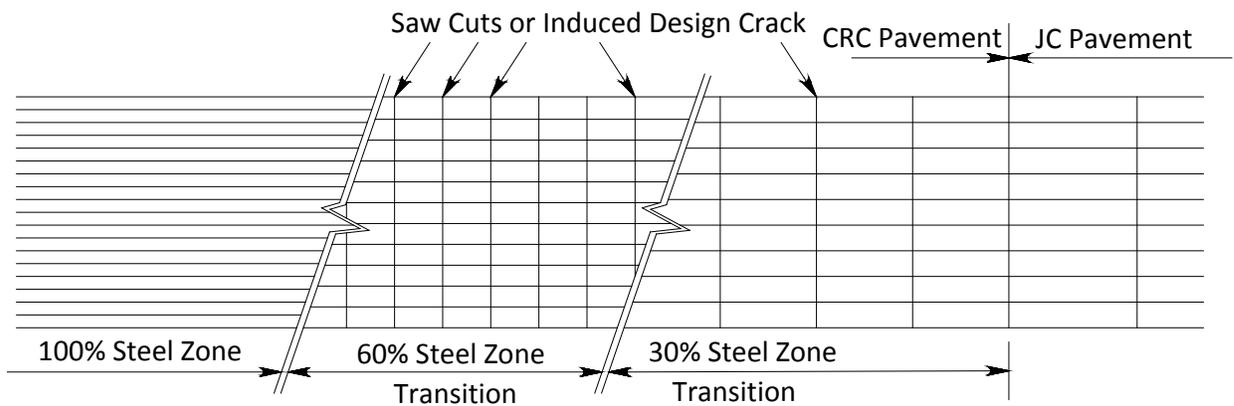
Gradual transition continuously reinforced to jointed pavement. (Jung et al. 2007)
